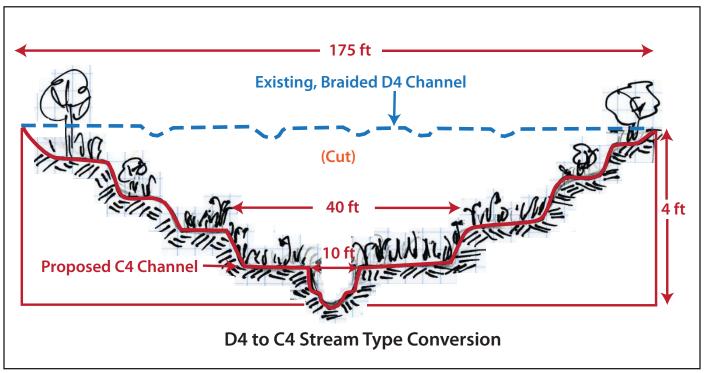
Schematic of the proposed excavation and shaping of a multi-stage channel and valley cross-section for the D4 to C4 stream type conversion below the West Creek road crossing.
